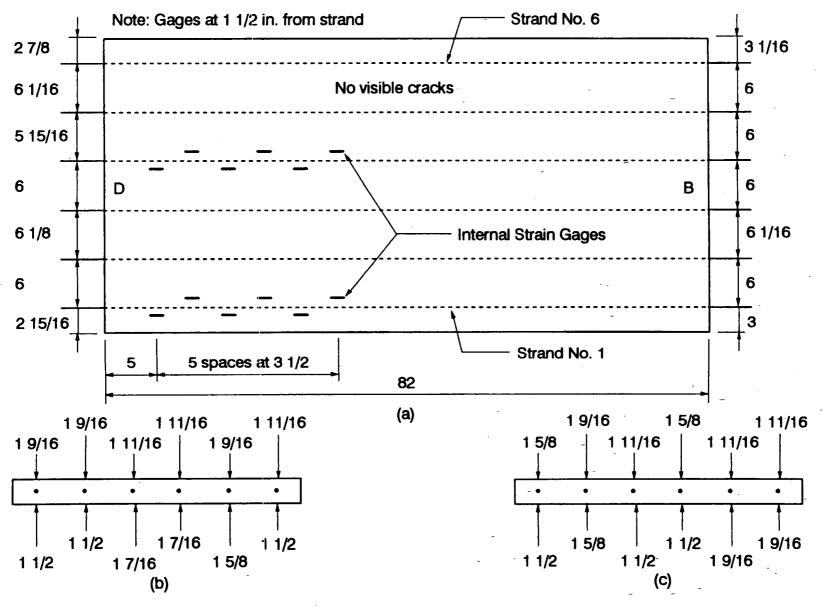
Specimen No. 12-3.0TC-2 (dimensions shown in inches):
